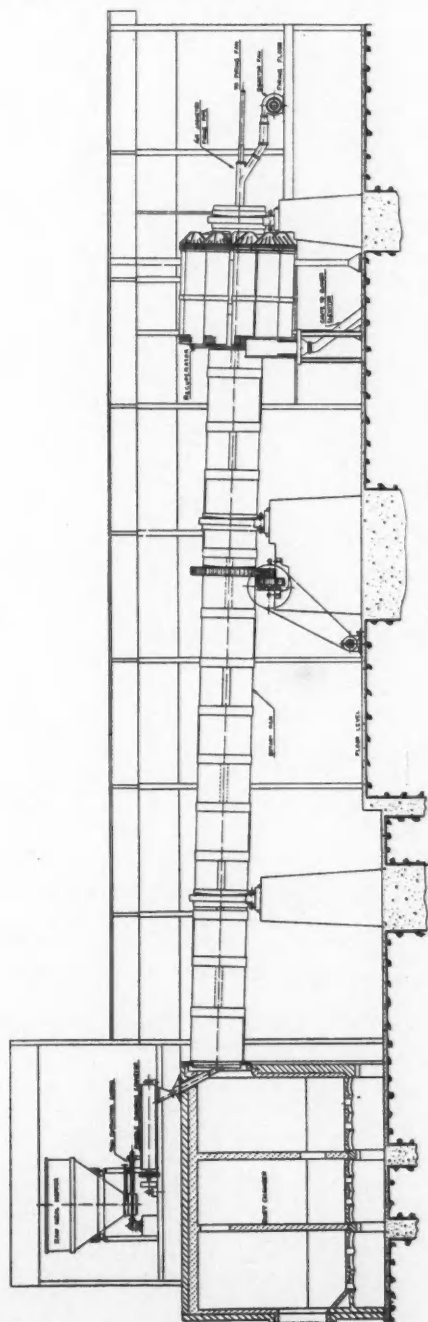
Section through Kiln showing New Feed, Drive, Cooler and Firing arrangements, etc.
